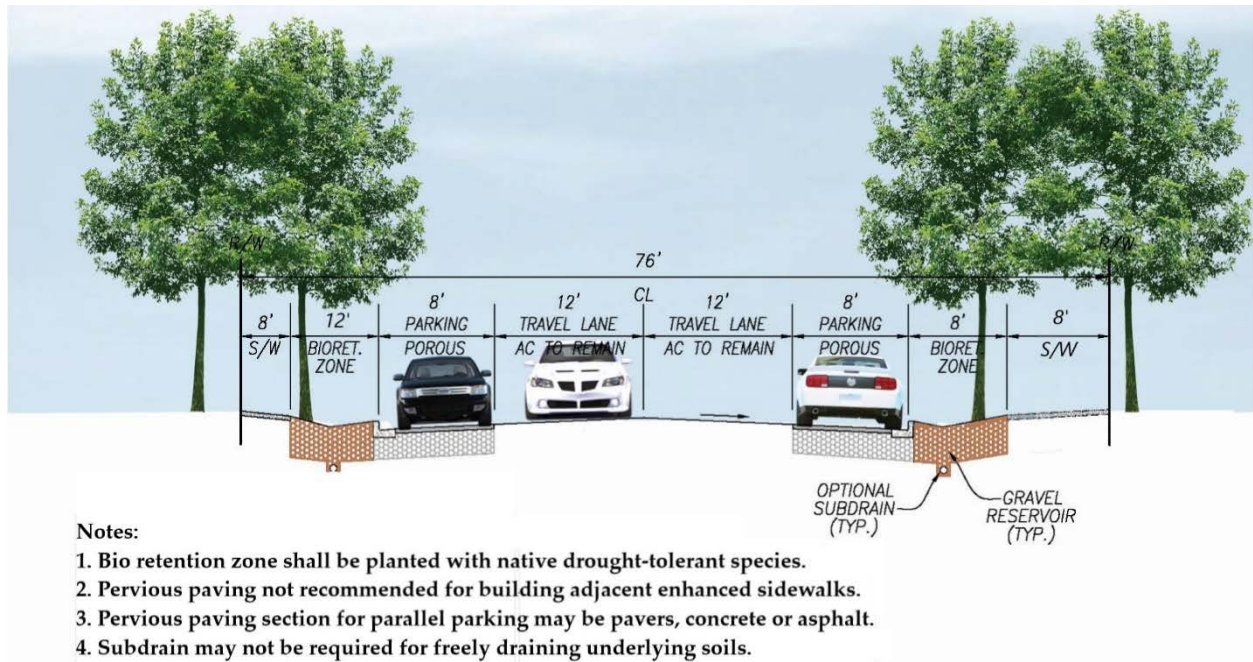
Flint Street, Pottery Street and Limited Street Cross-Section
